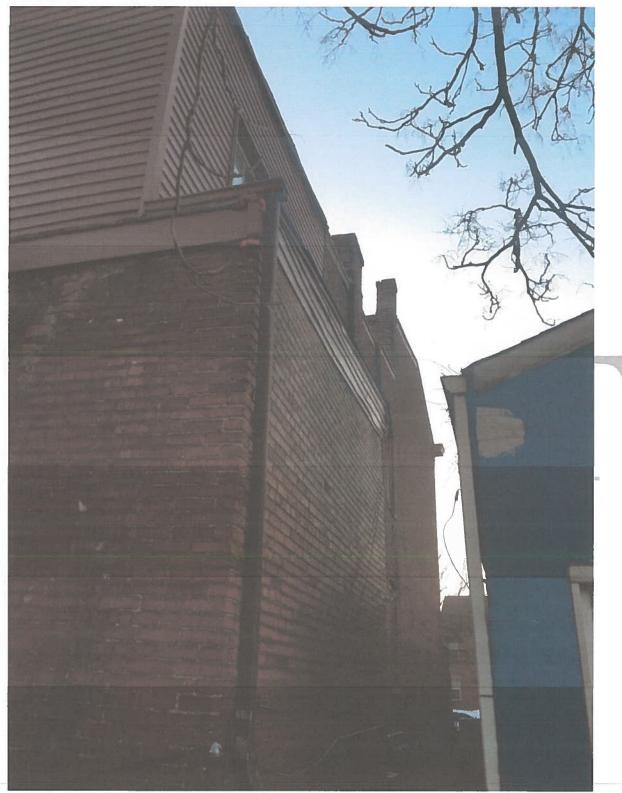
North Facing Side of Nugent House from the Rear and Property to the South of the Nugent House, Looking West
